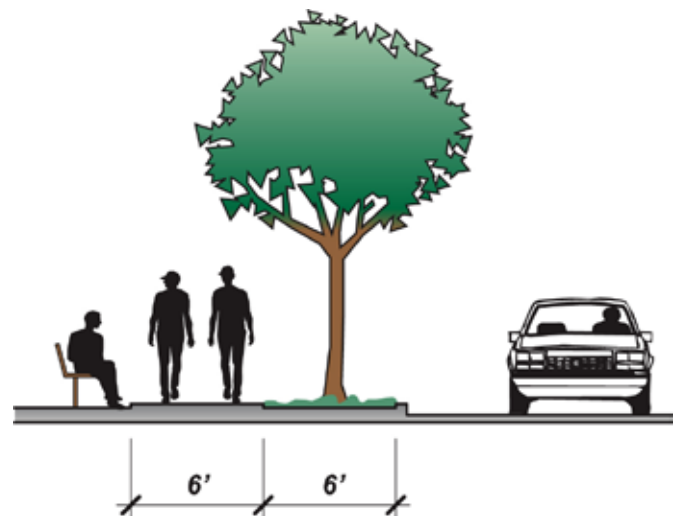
Typical sidewalk improvements for Vandegrift Blvd.
